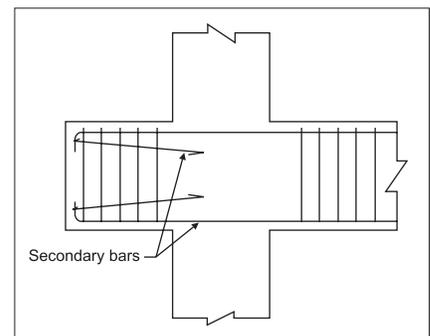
Reinforcement detail at an external joint with stub beam<sup>17</sup>
